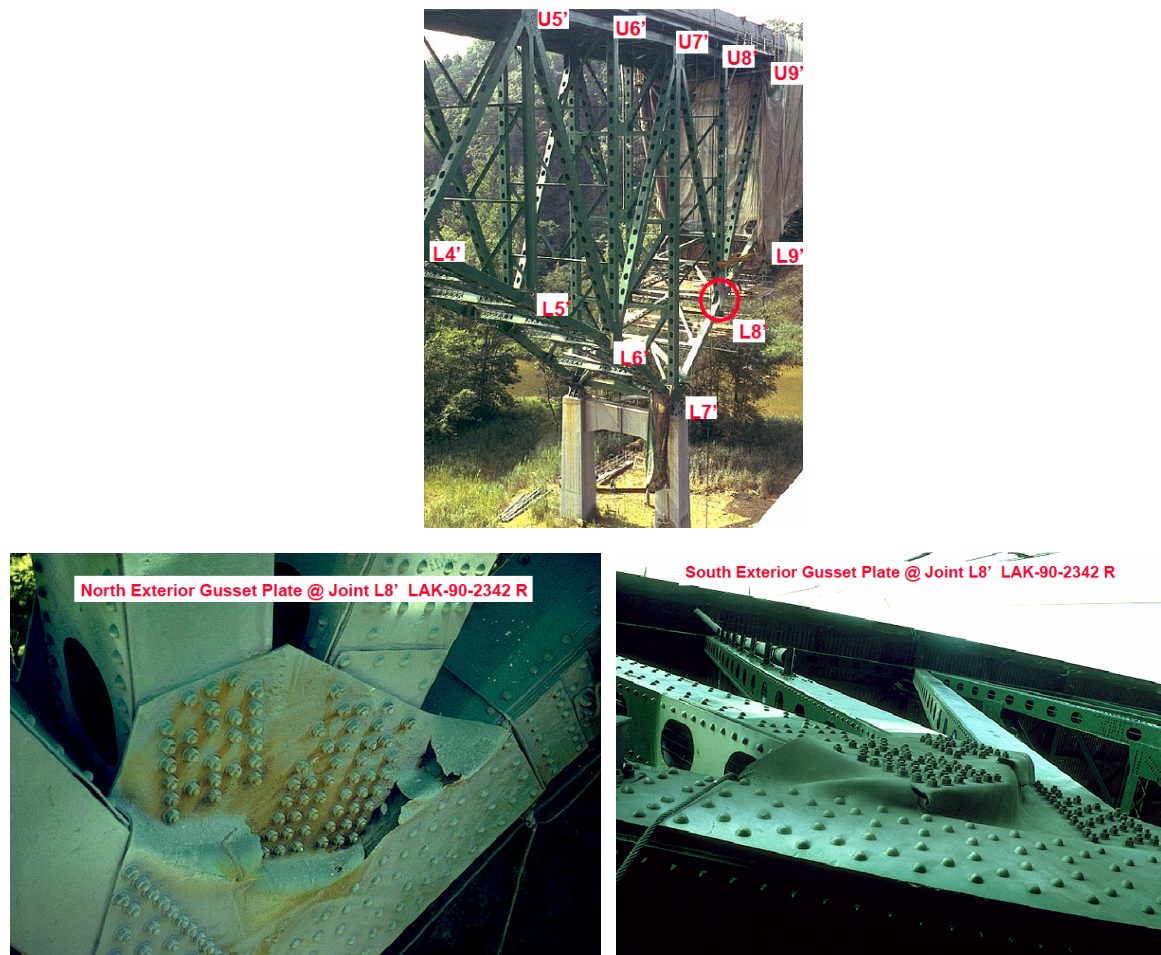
Damaged gusset plates, Grand River Bridge, Ohio, USA (NTSB, 2008a)
